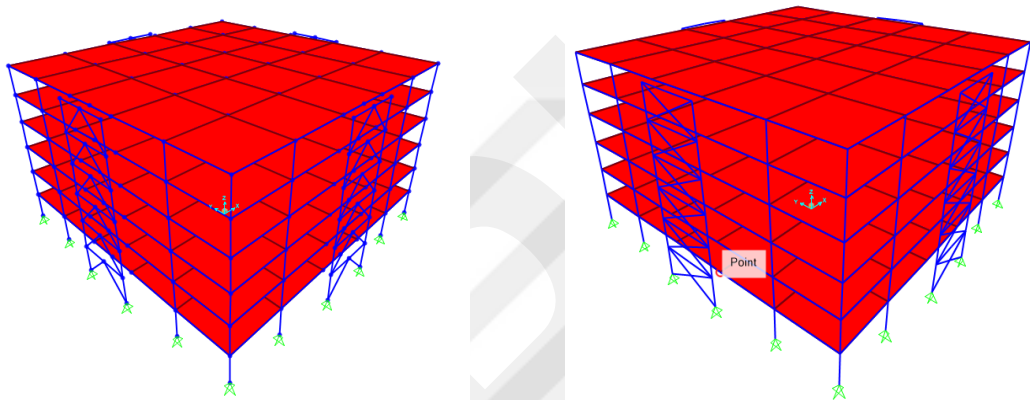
6-Story Strengthened Building Model with Inverted V- and X-Type External Steel Braces
